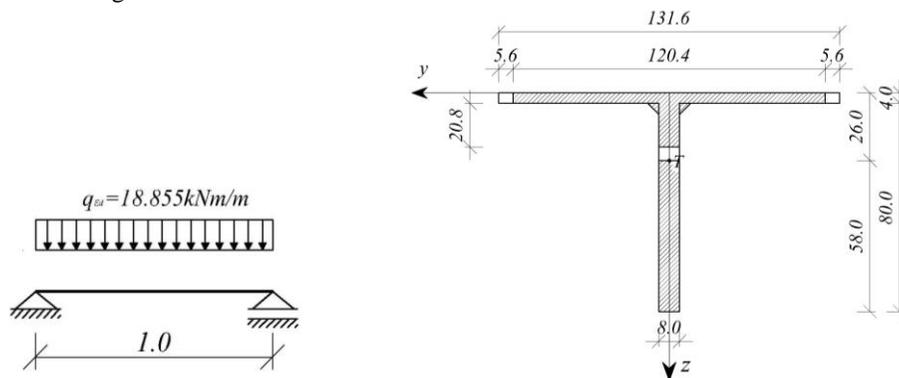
Static system (left) of a part of a stiffener between two horizontal stiffeners, and dimensiones of the stiffener (right)
